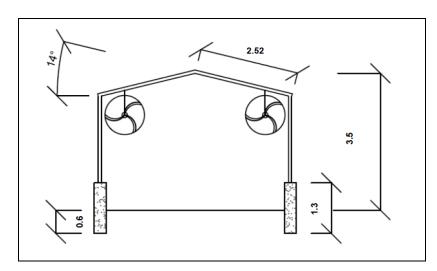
Cross section of the holding pen, with dimensions in meters.
